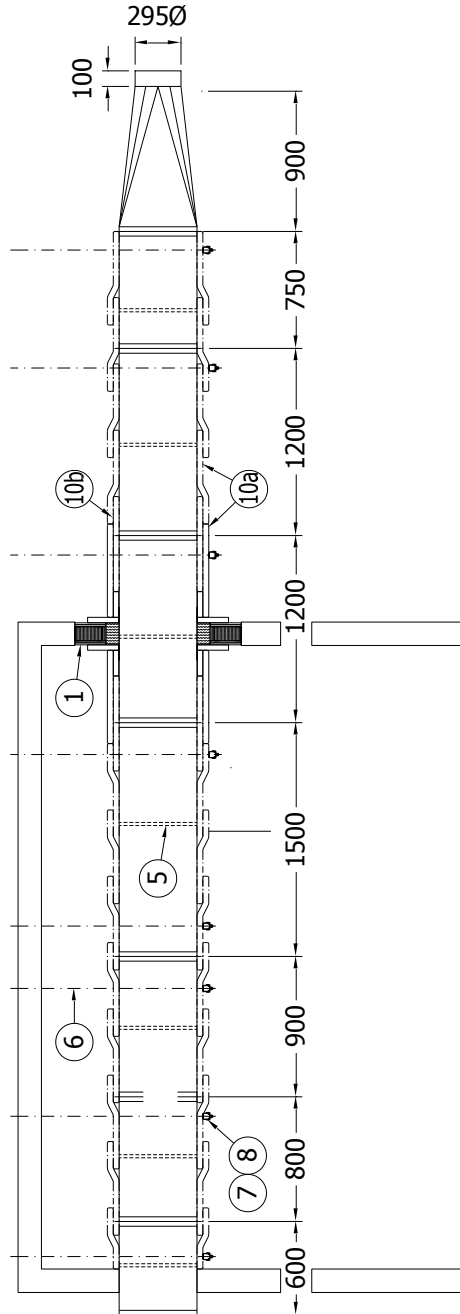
Typical Plan View of Horizontal Assembly
